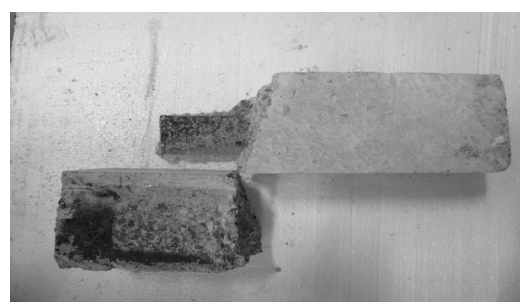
Failure surface of concrete beam strengthened with CFRP fabric in -20°C
